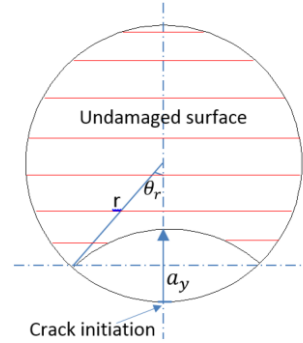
crack growth on a reinforcing bar cross section [15]
